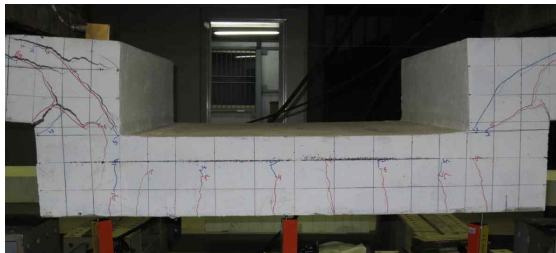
Cracking of specimen-3 by loading stage
